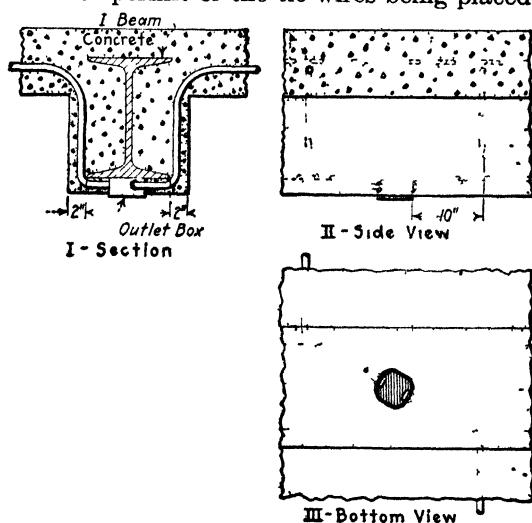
Outlet box installed in restricted space, conduit bends of standard radius being used
